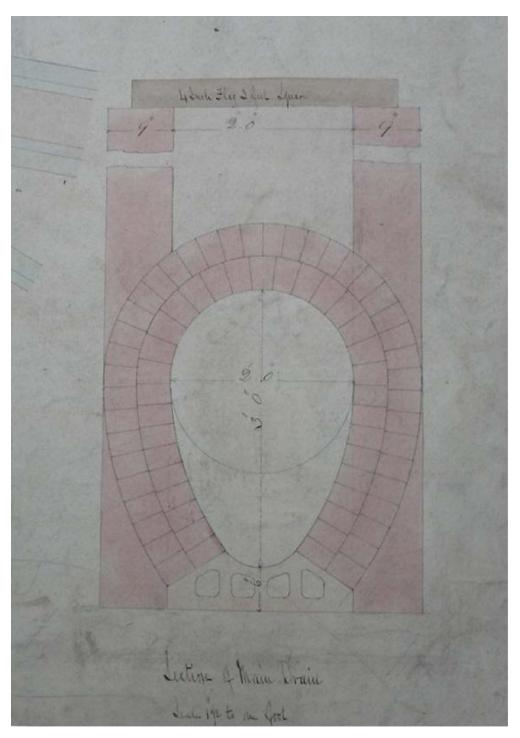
Cross-section of culvert, as designed (NA RAIL 527.2368)
